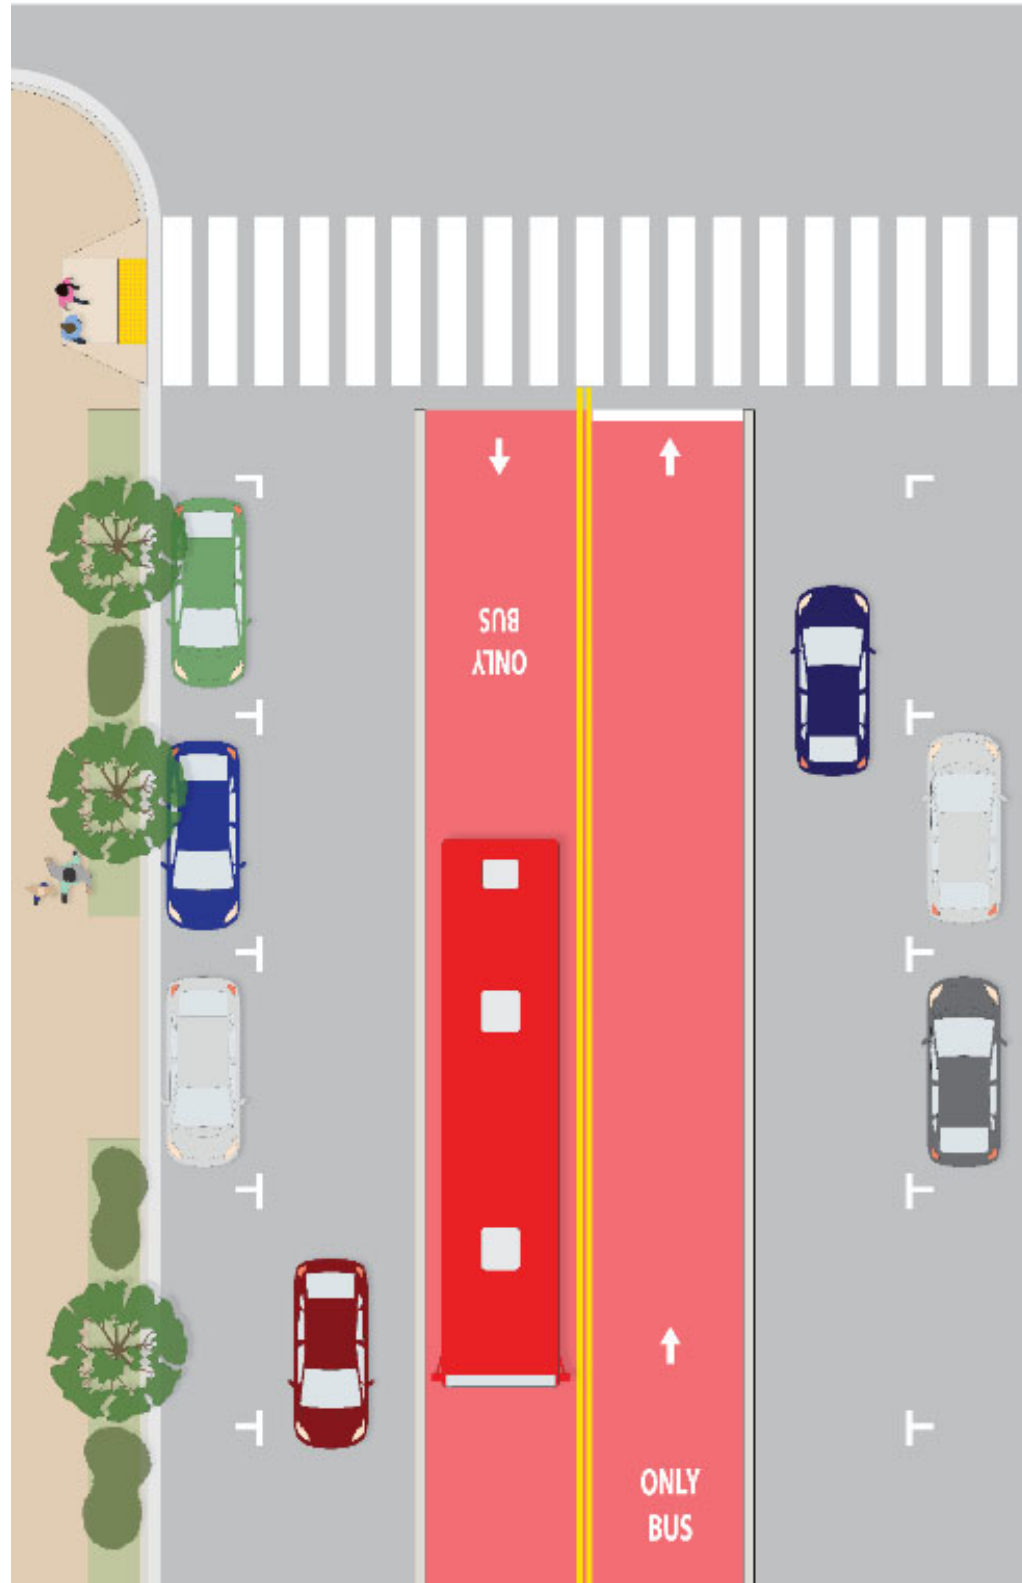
CENTER RUNNING TRANSIT LANES PLAN VIEW
